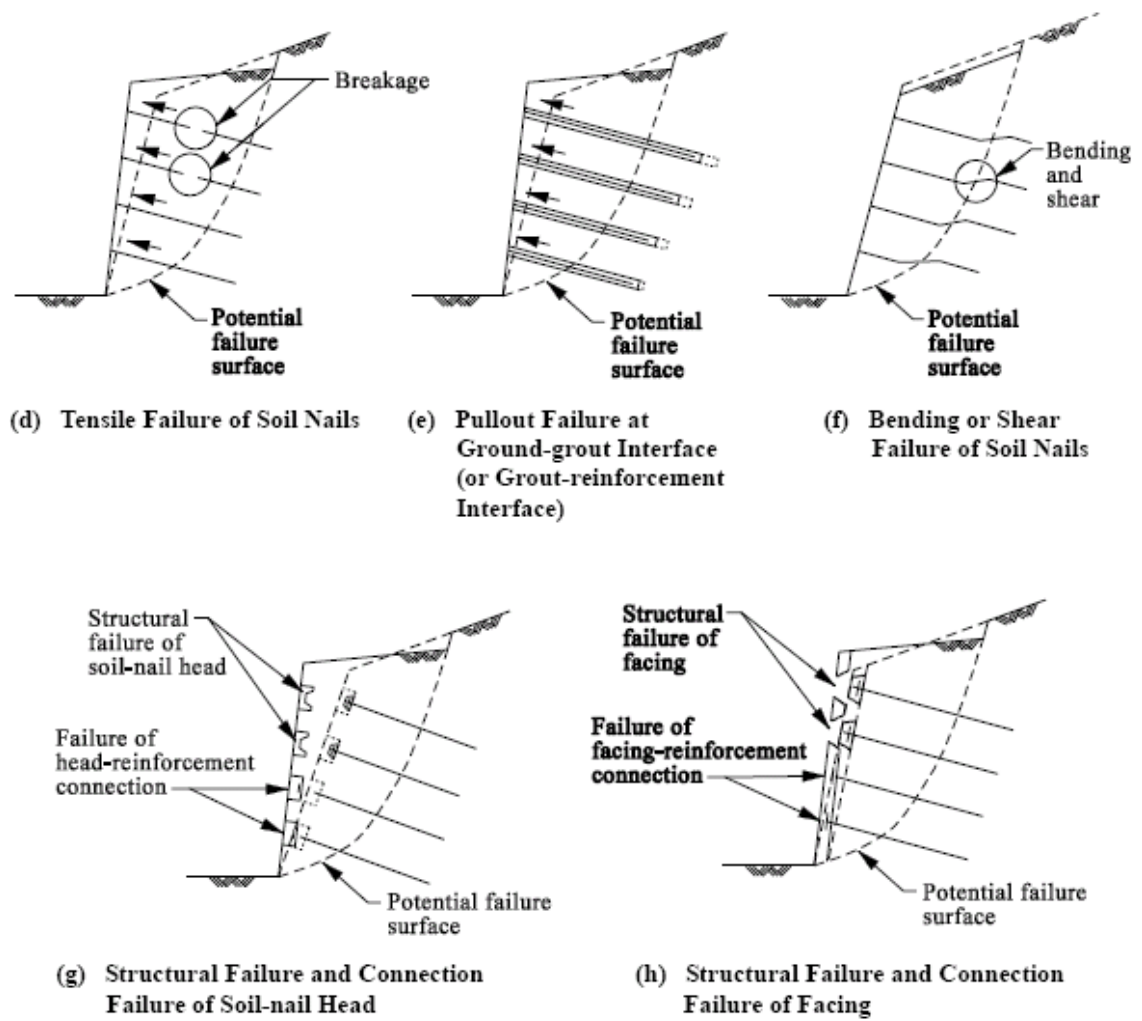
Potential internal failure modes of a soil nailed system (after GEO 2008)
